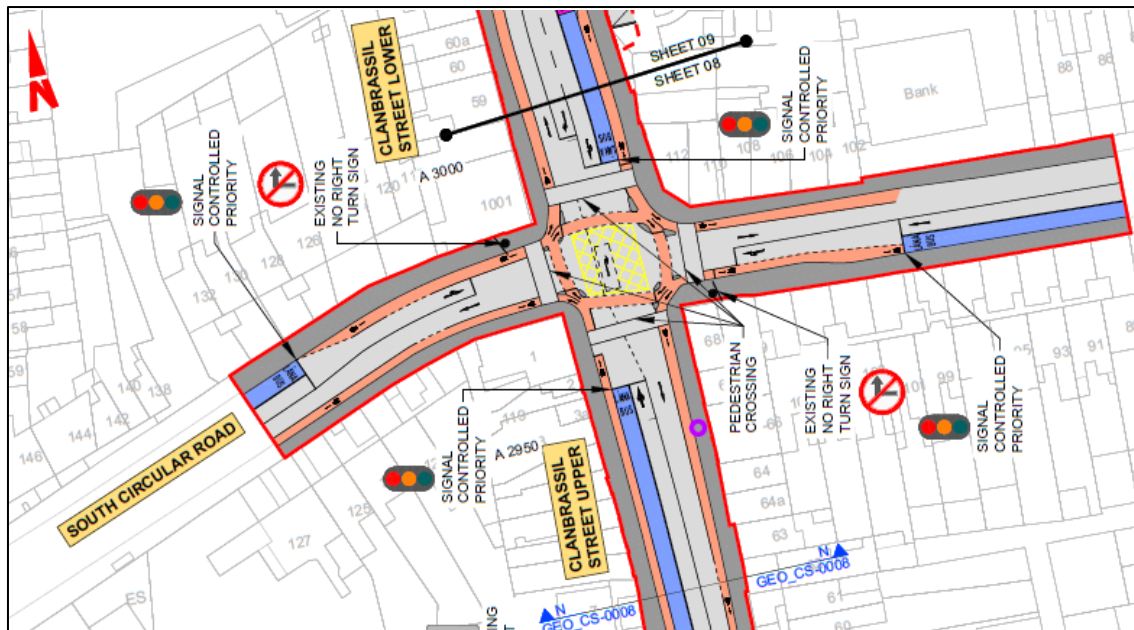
Proposed Scheme Layout at Leonard's Corner Junction
